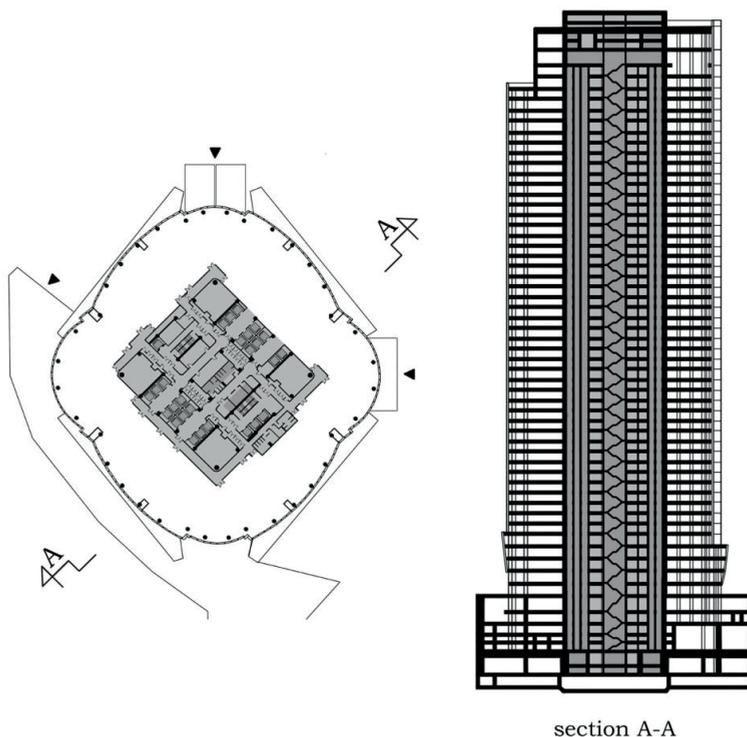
Roppongi Hills Mori Tower: floor plan and section, developed by authors [13]
